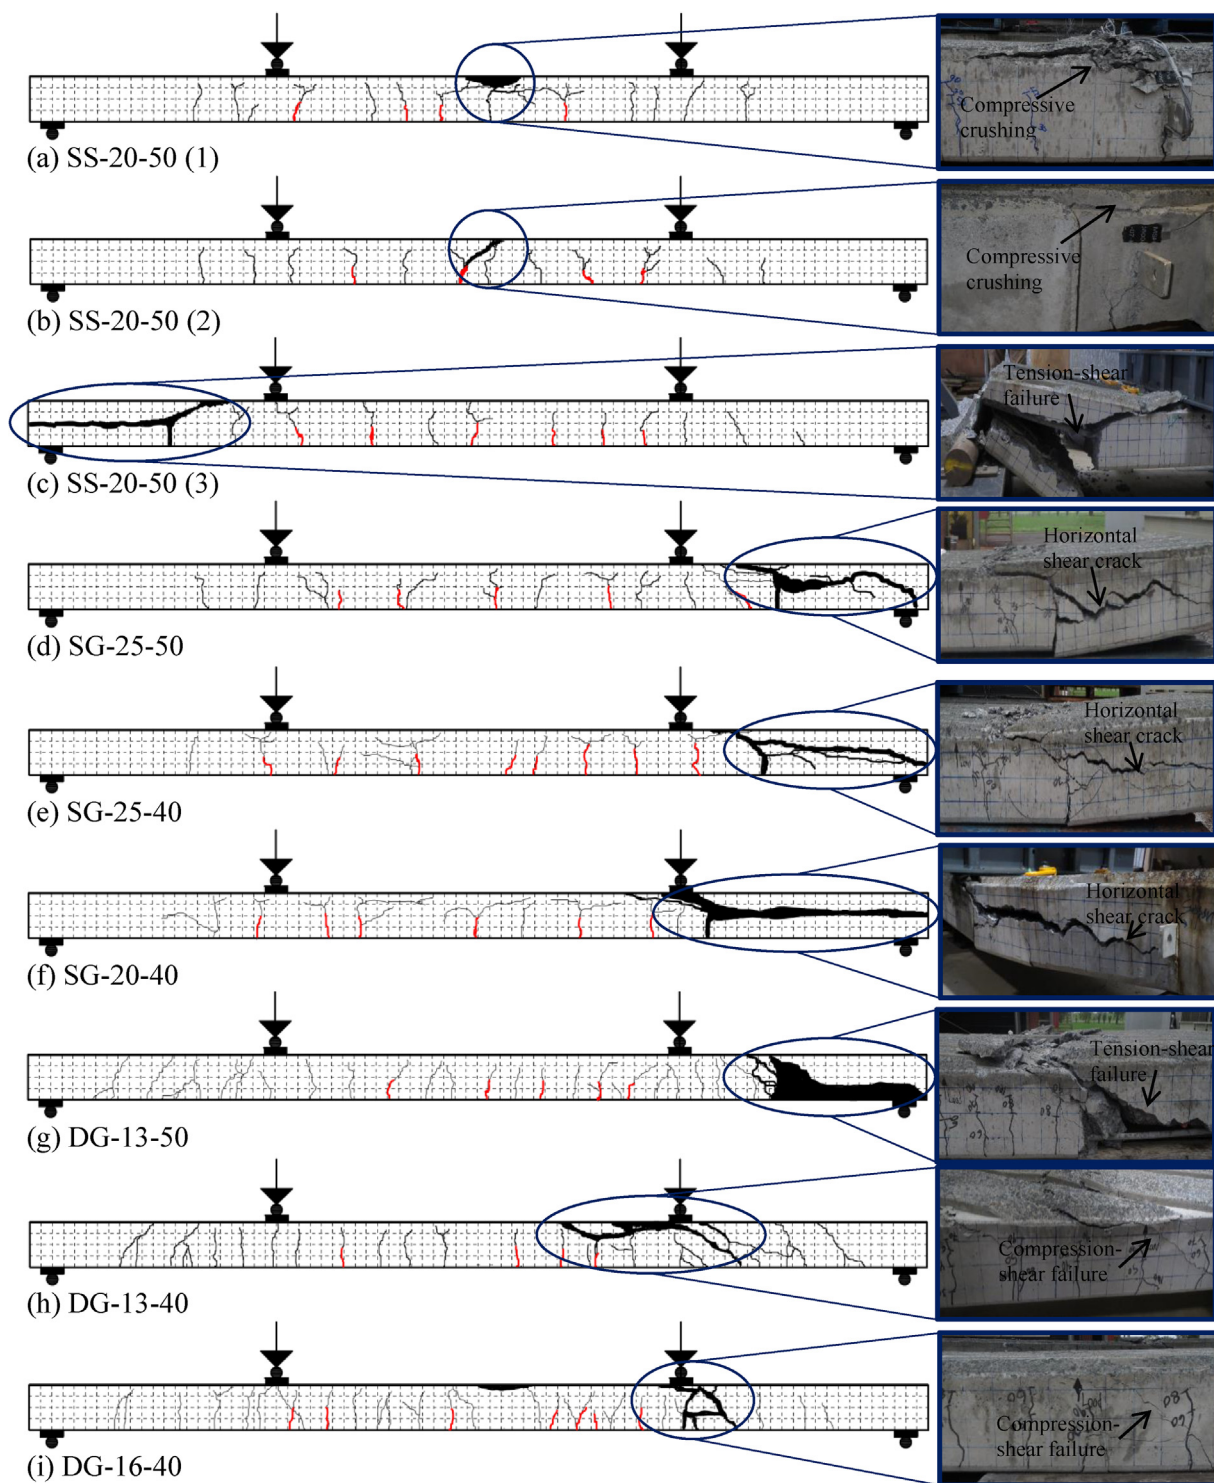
Crack propagation and final failure of precast-concrete planks.
